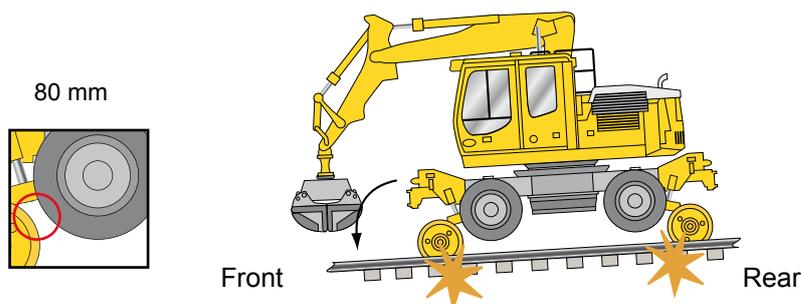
l - The machine operator begins to lower the front rail wheels (they move because of the presence of the electrical fault). However, the disturbance to the rear chassis caused by this movement results in the electrical fault disappearing and the interlock is automatically reinstated (paragraph 128). Consequently the front rail wheels now stop moving with approx 80 mm gap (inset) (paragraph 106) and the machine operator thinks that the rail wheels are fully down. The RRV's rail controls are now locked and the machine is in a free-wheel state.
